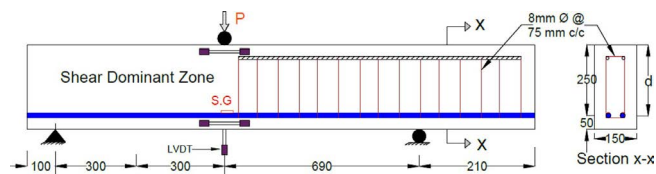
Test set up of prestressed beams tested by Lakavath *et al.* [37].
